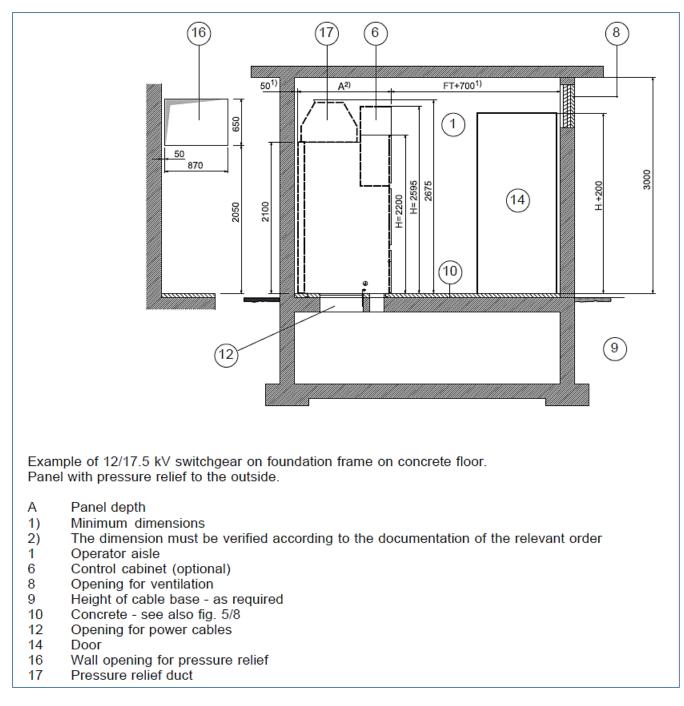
Elevation assembly of the switchgear at site (details of pressure relief duct)
